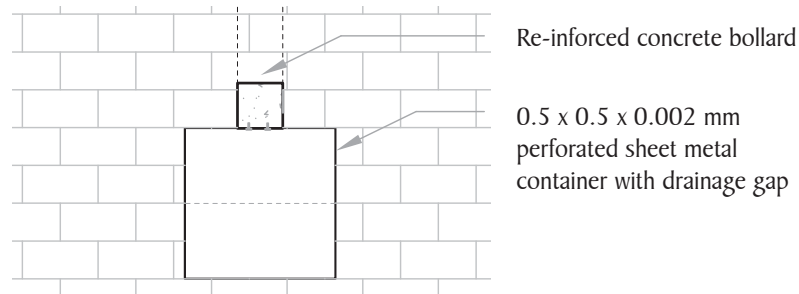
Litter Bin Plan. Scale: 1:25 (Author, 2008)
